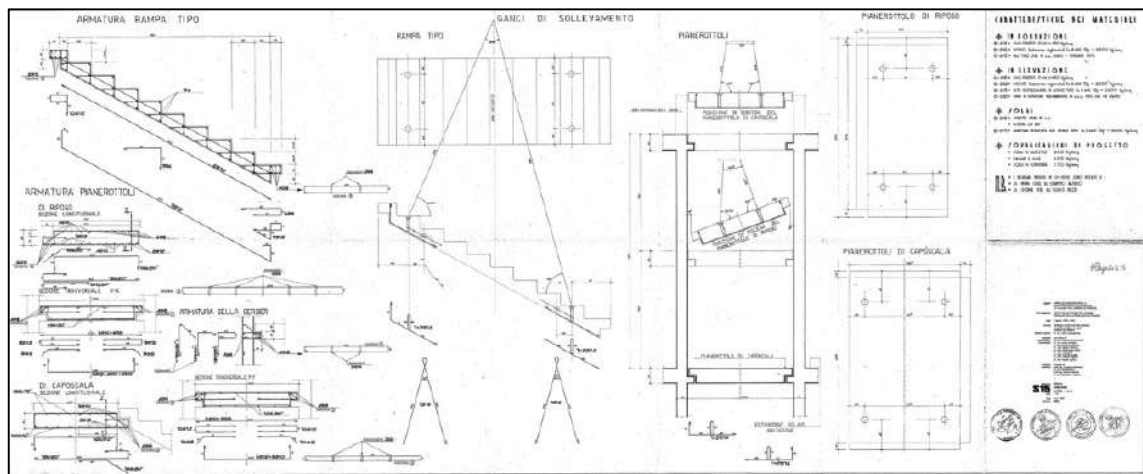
Precast reinforced concrete stairs: technological solution and erection diagram (S15_STRUCTURAL)
